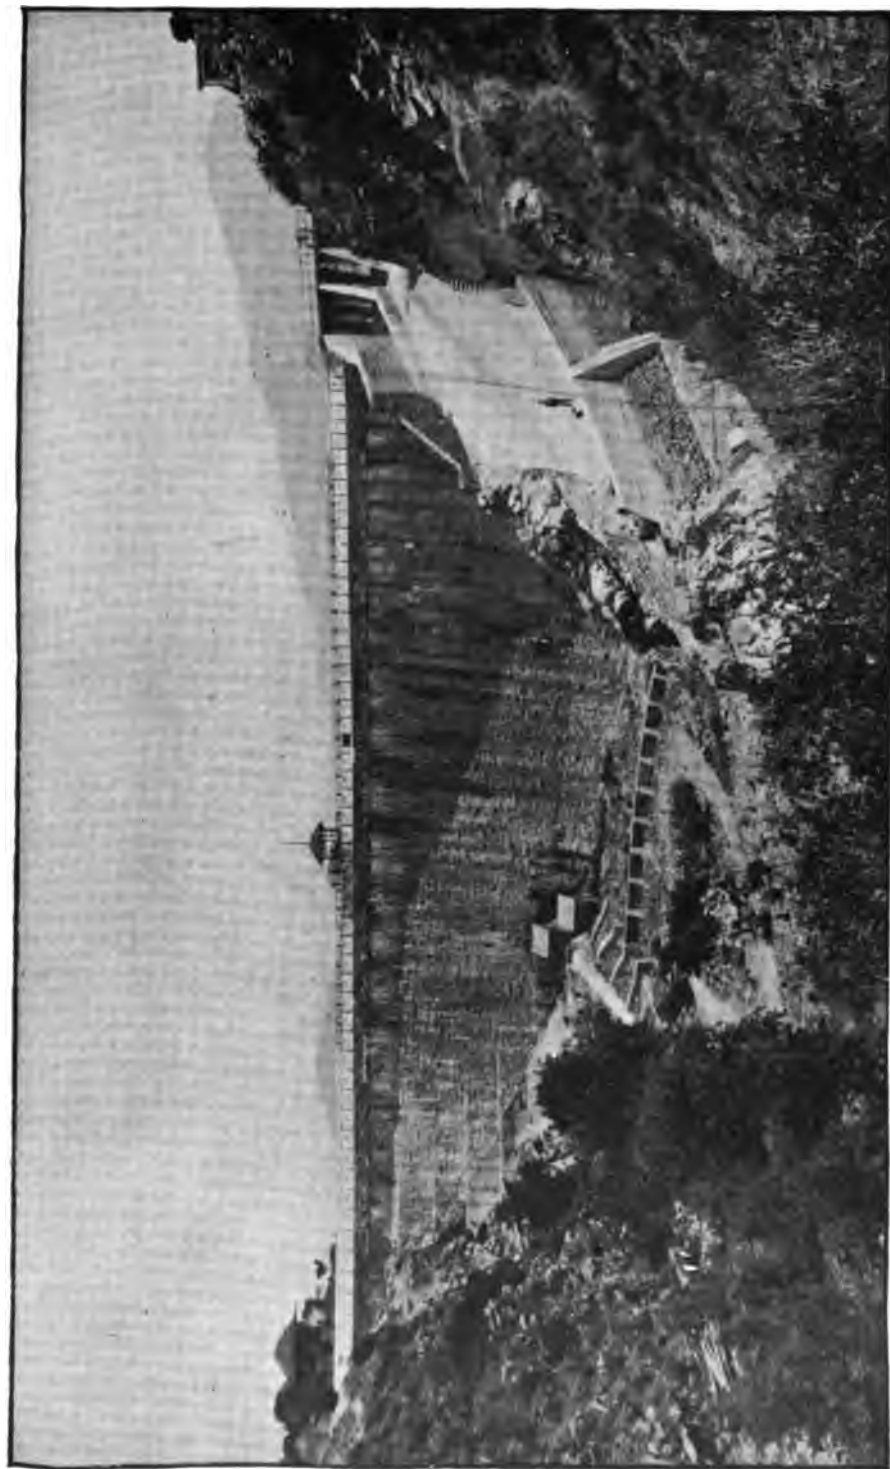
SWEETWATER DAM, SHOWING NEW APRON OF SPILLWAY AND PROTECTING SPUR-WALLS ON PIPE-LINE.
